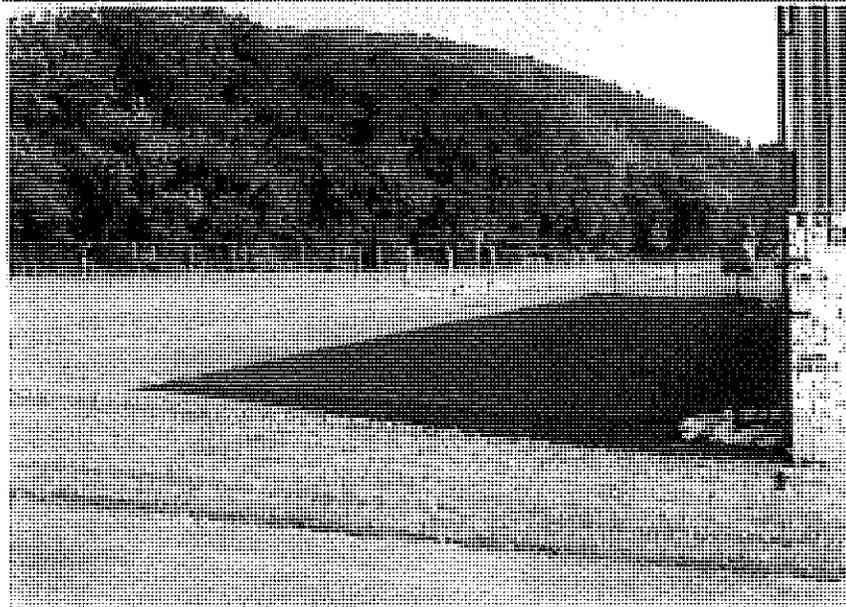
Project area, Parcel A, facing south adjacent to Owego Free Academy, unstable area due to prior construction activities.
